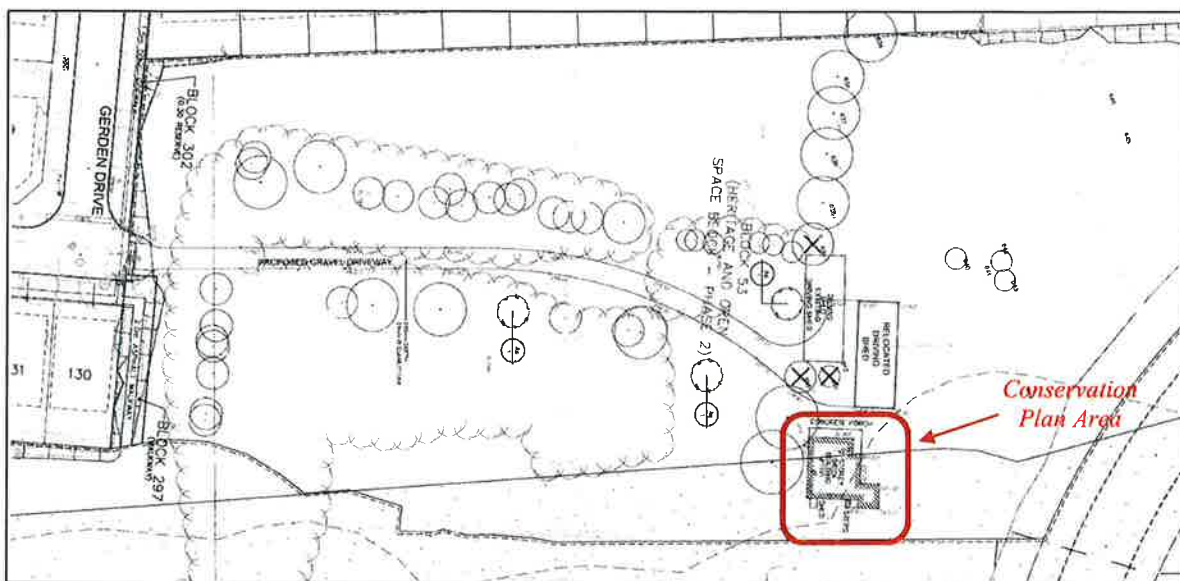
Conservation Plan Context *Source: Part of Heritage House Landscape Plan prepared by the mbtw group, dated May 30, 2019.
